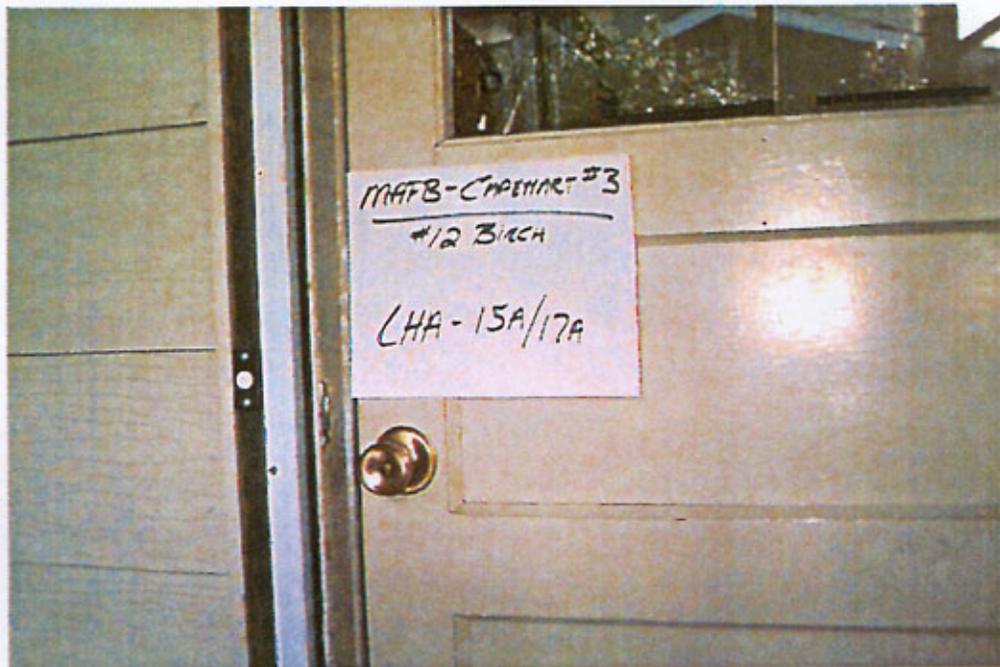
White Wood Door and Door Jamb (LHA-14A & 17A)
